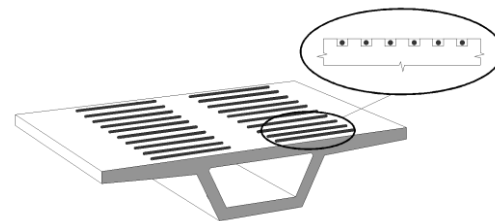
NSM Fe-SMA bar strengthening of a bridge-section
